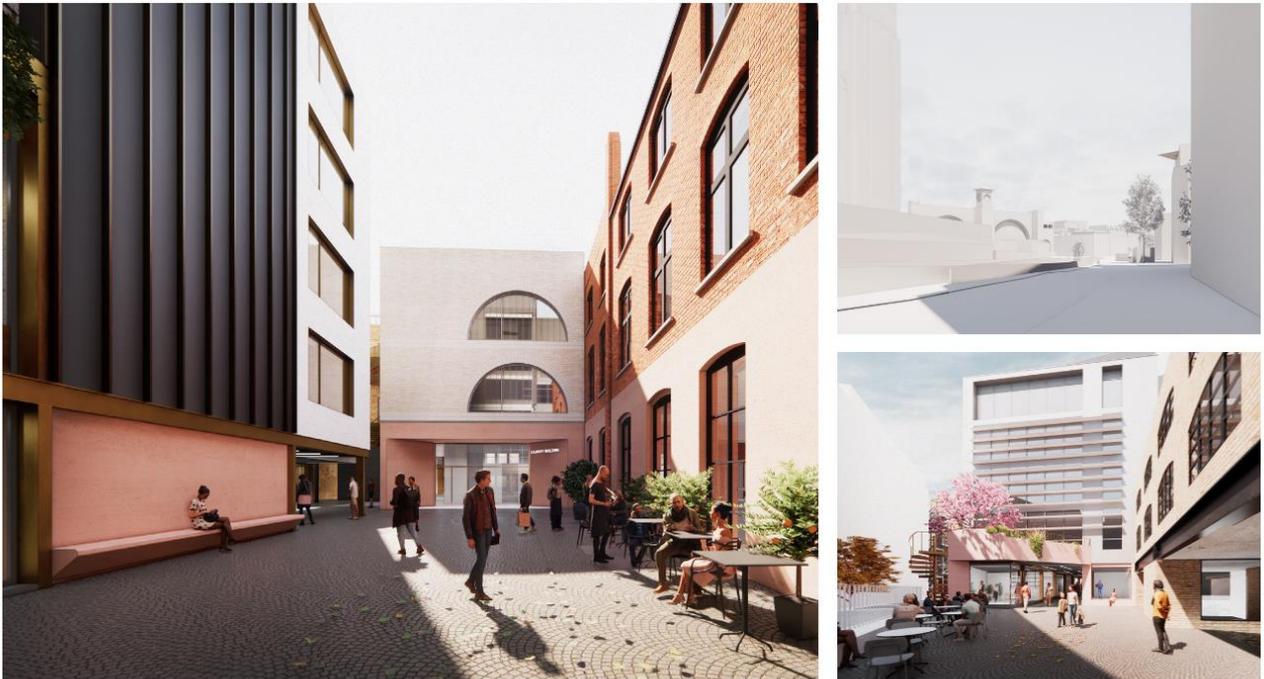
Times House/Laundry Buildings - Scheme presented to DRP April 2021
